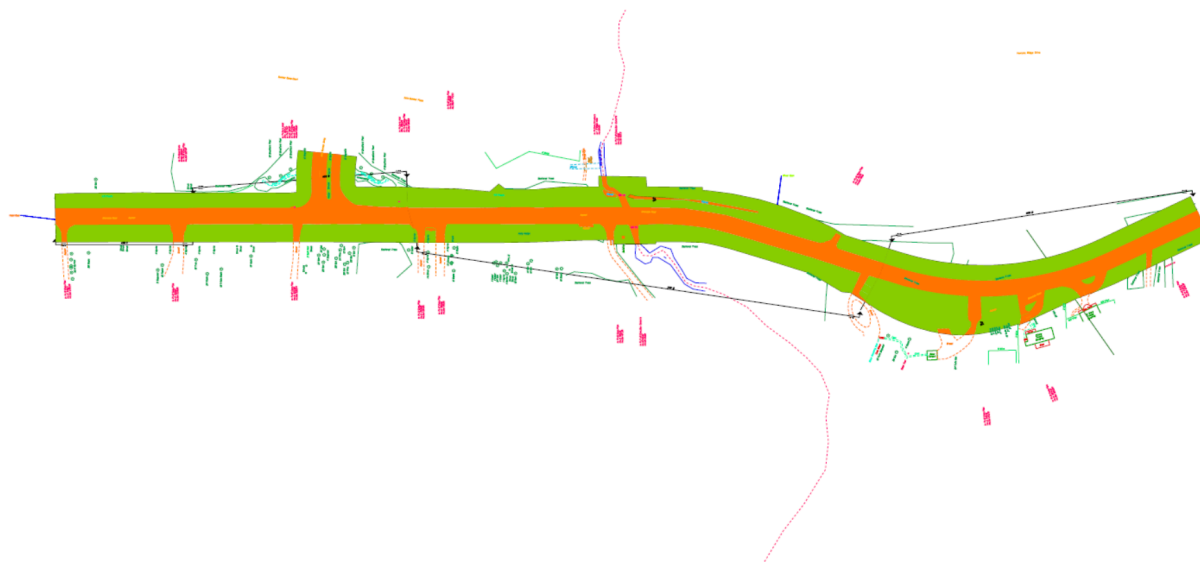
Plan View of Proposed Design with Land Types of Entire Project Area
